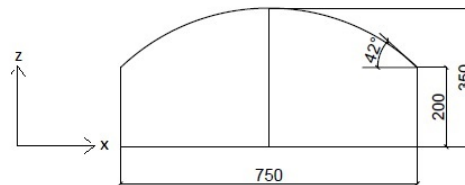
Section drawing of the cylindrical roof shape with dimensions [cm].
